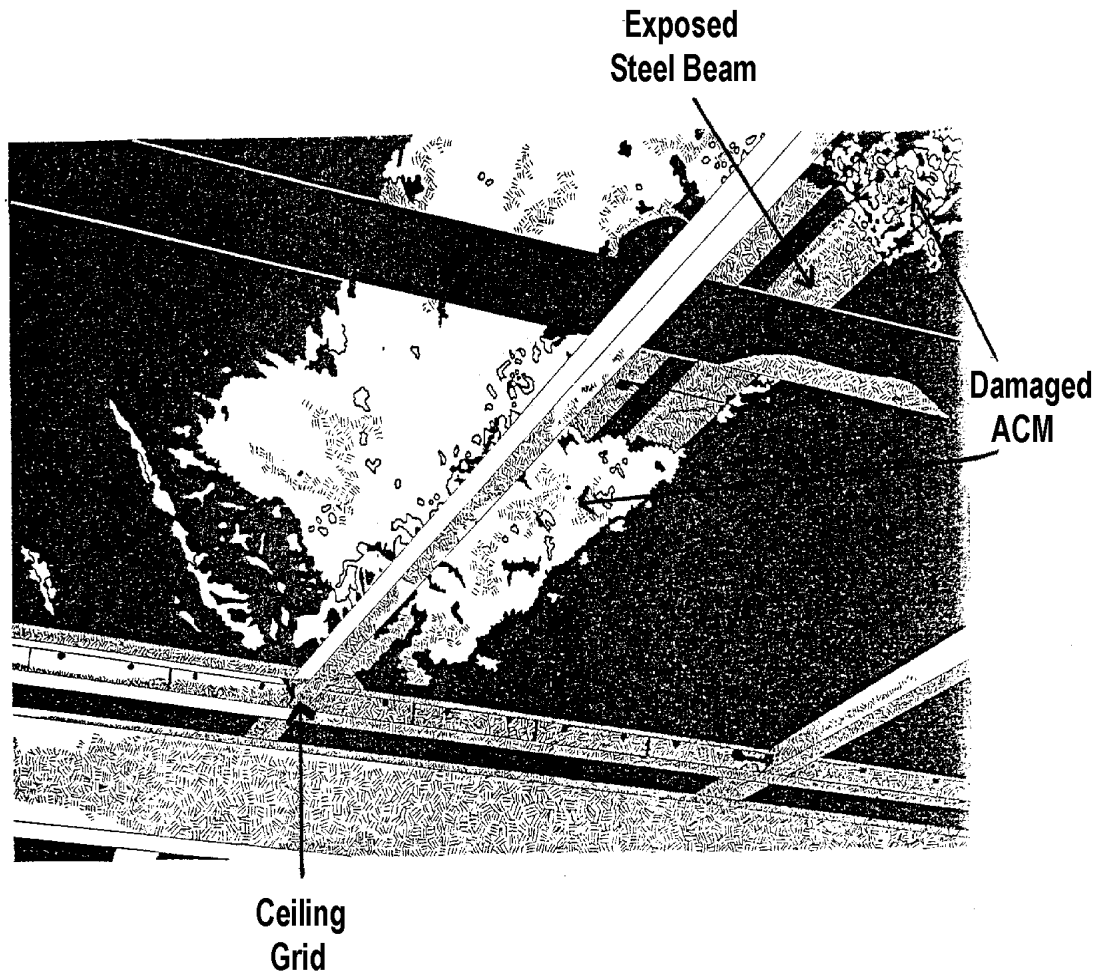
Damaged Sprayed-On Asbestos-Containing Fireproofing Applied to Structural Steel.
